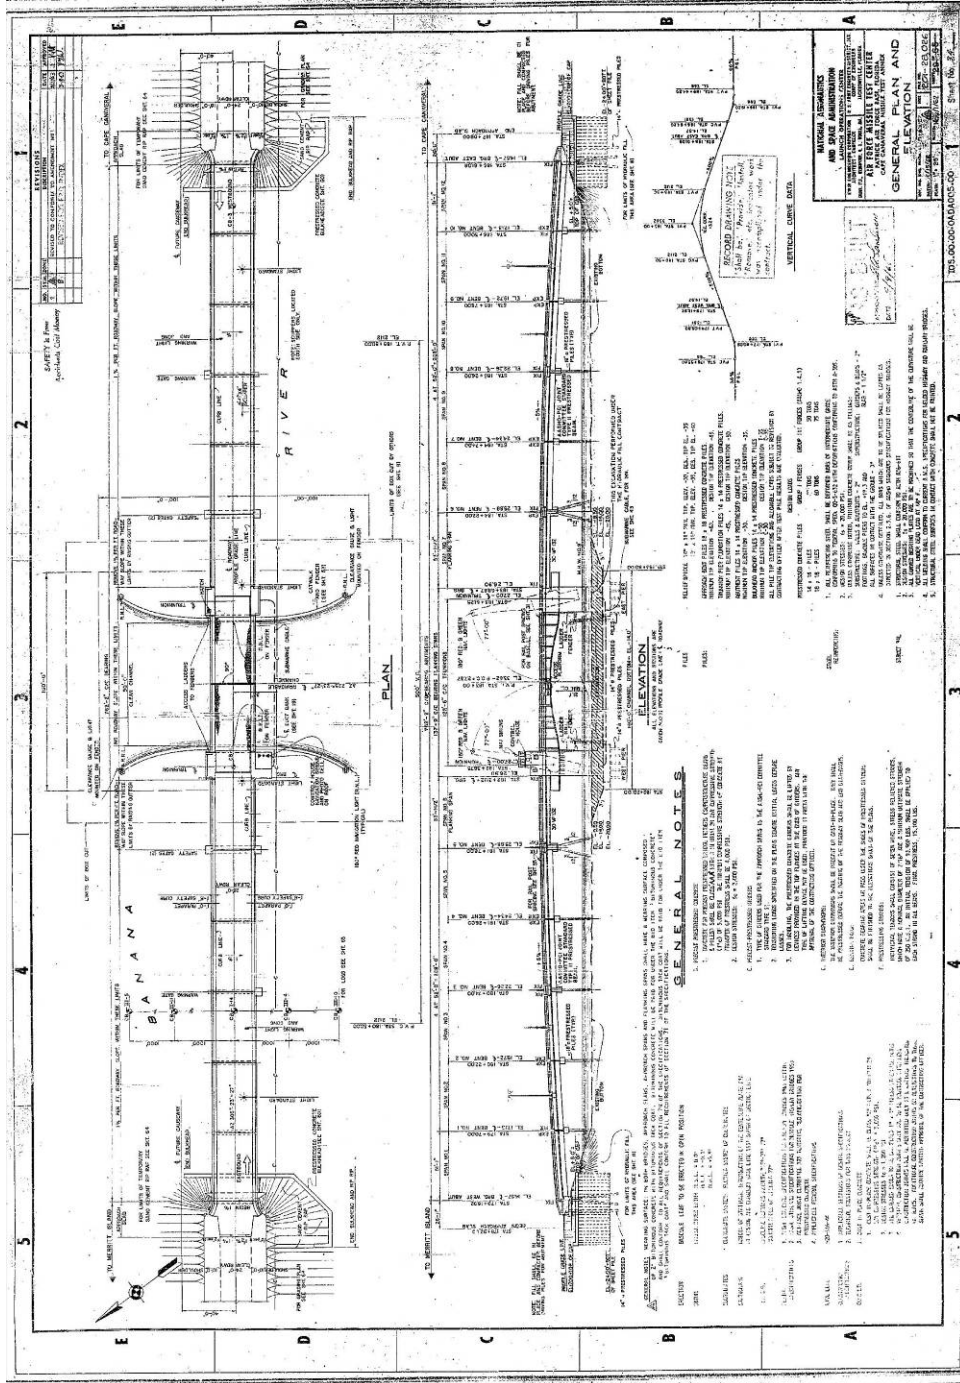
Ewin Engineering Corporation, "Banana River-Orsino Causeway," General Plan and Elevation, November 1962, Sheet 34.
